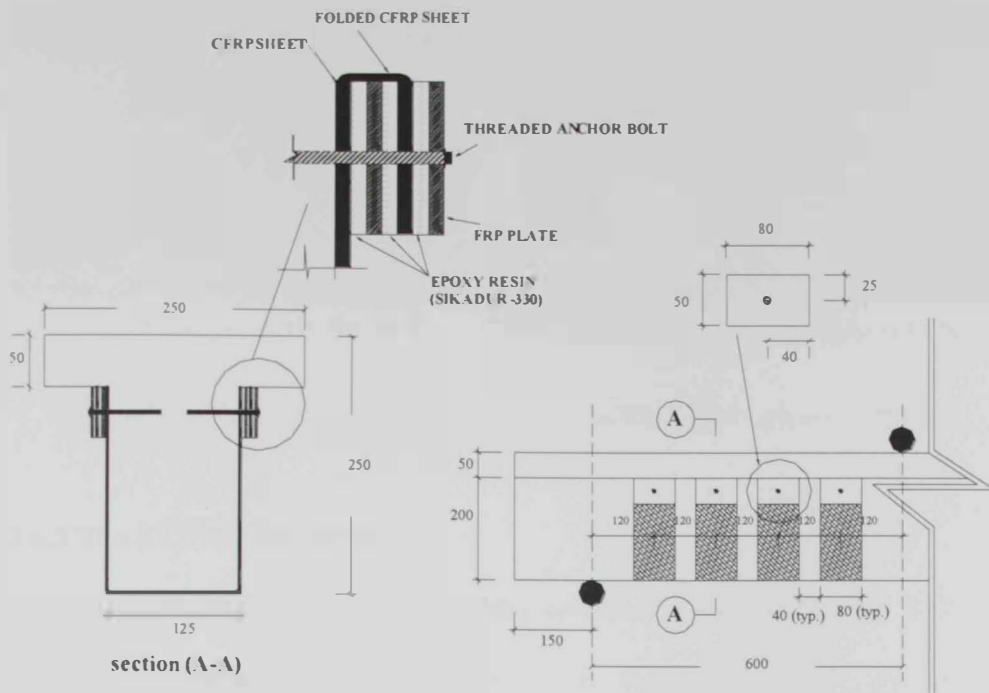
Positions and dimensions of the CFRP sheets and the MA system (dimensions are in mm).
